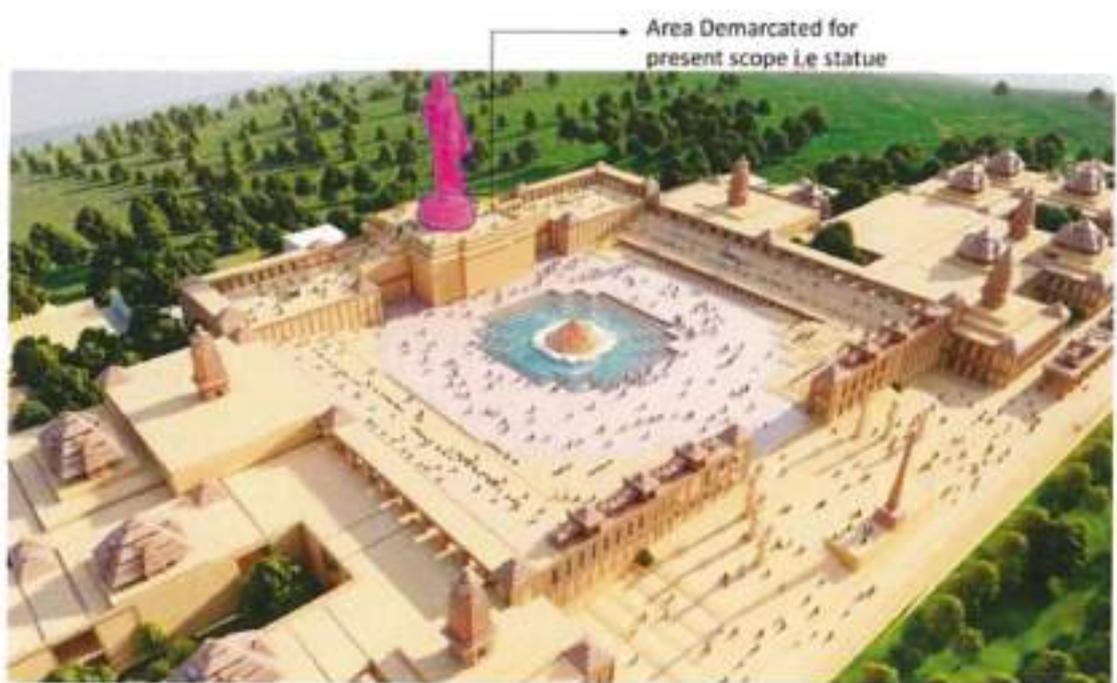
Typical aerial view of statue (i.e. present scope of work)
